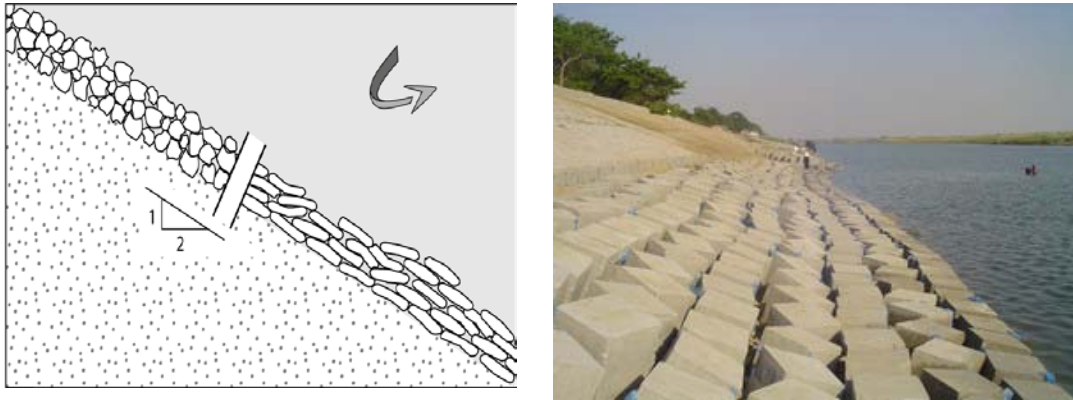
Different types of self adjusting revetment: multi-layer riprap and geobags (left), loose cement concrete blocks (right)
